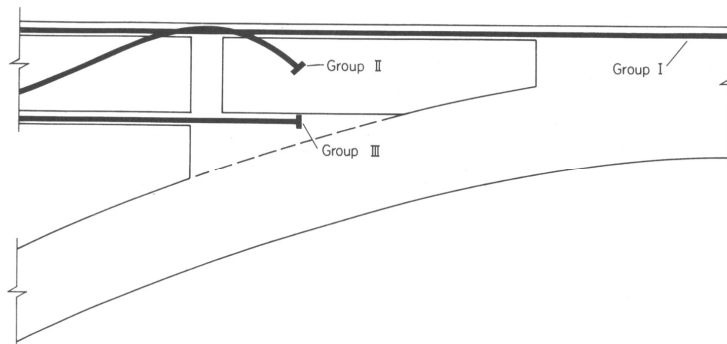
Prestressing Tendon Arrangement near Crown<sup>24</sup>
